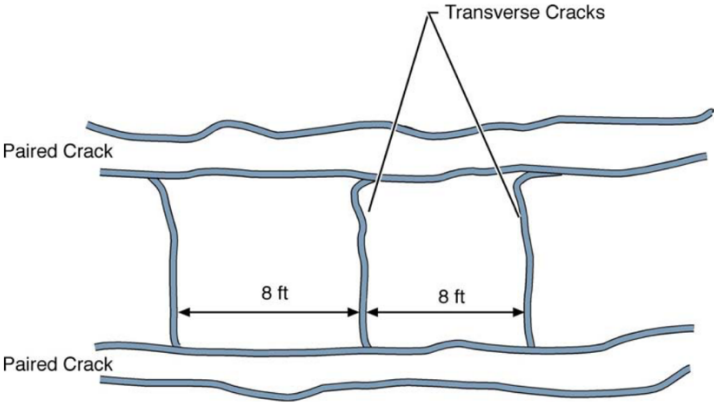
Typical cracking pattern in CIP-PCP Bridge Decks (Folliard, 2003)
